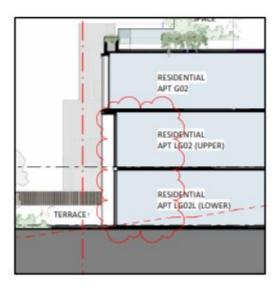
Section 01 As approved (Dec 2021) and proposed – current amendment.
